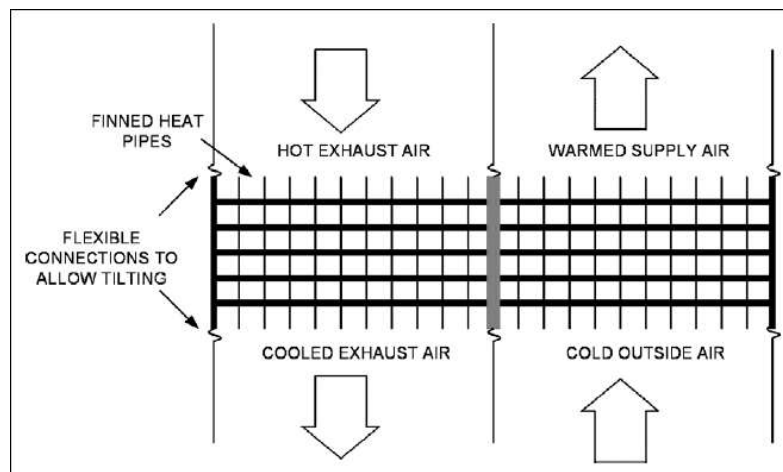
Heat Pipe Assembly in Exhaust and Outside Air Entry
